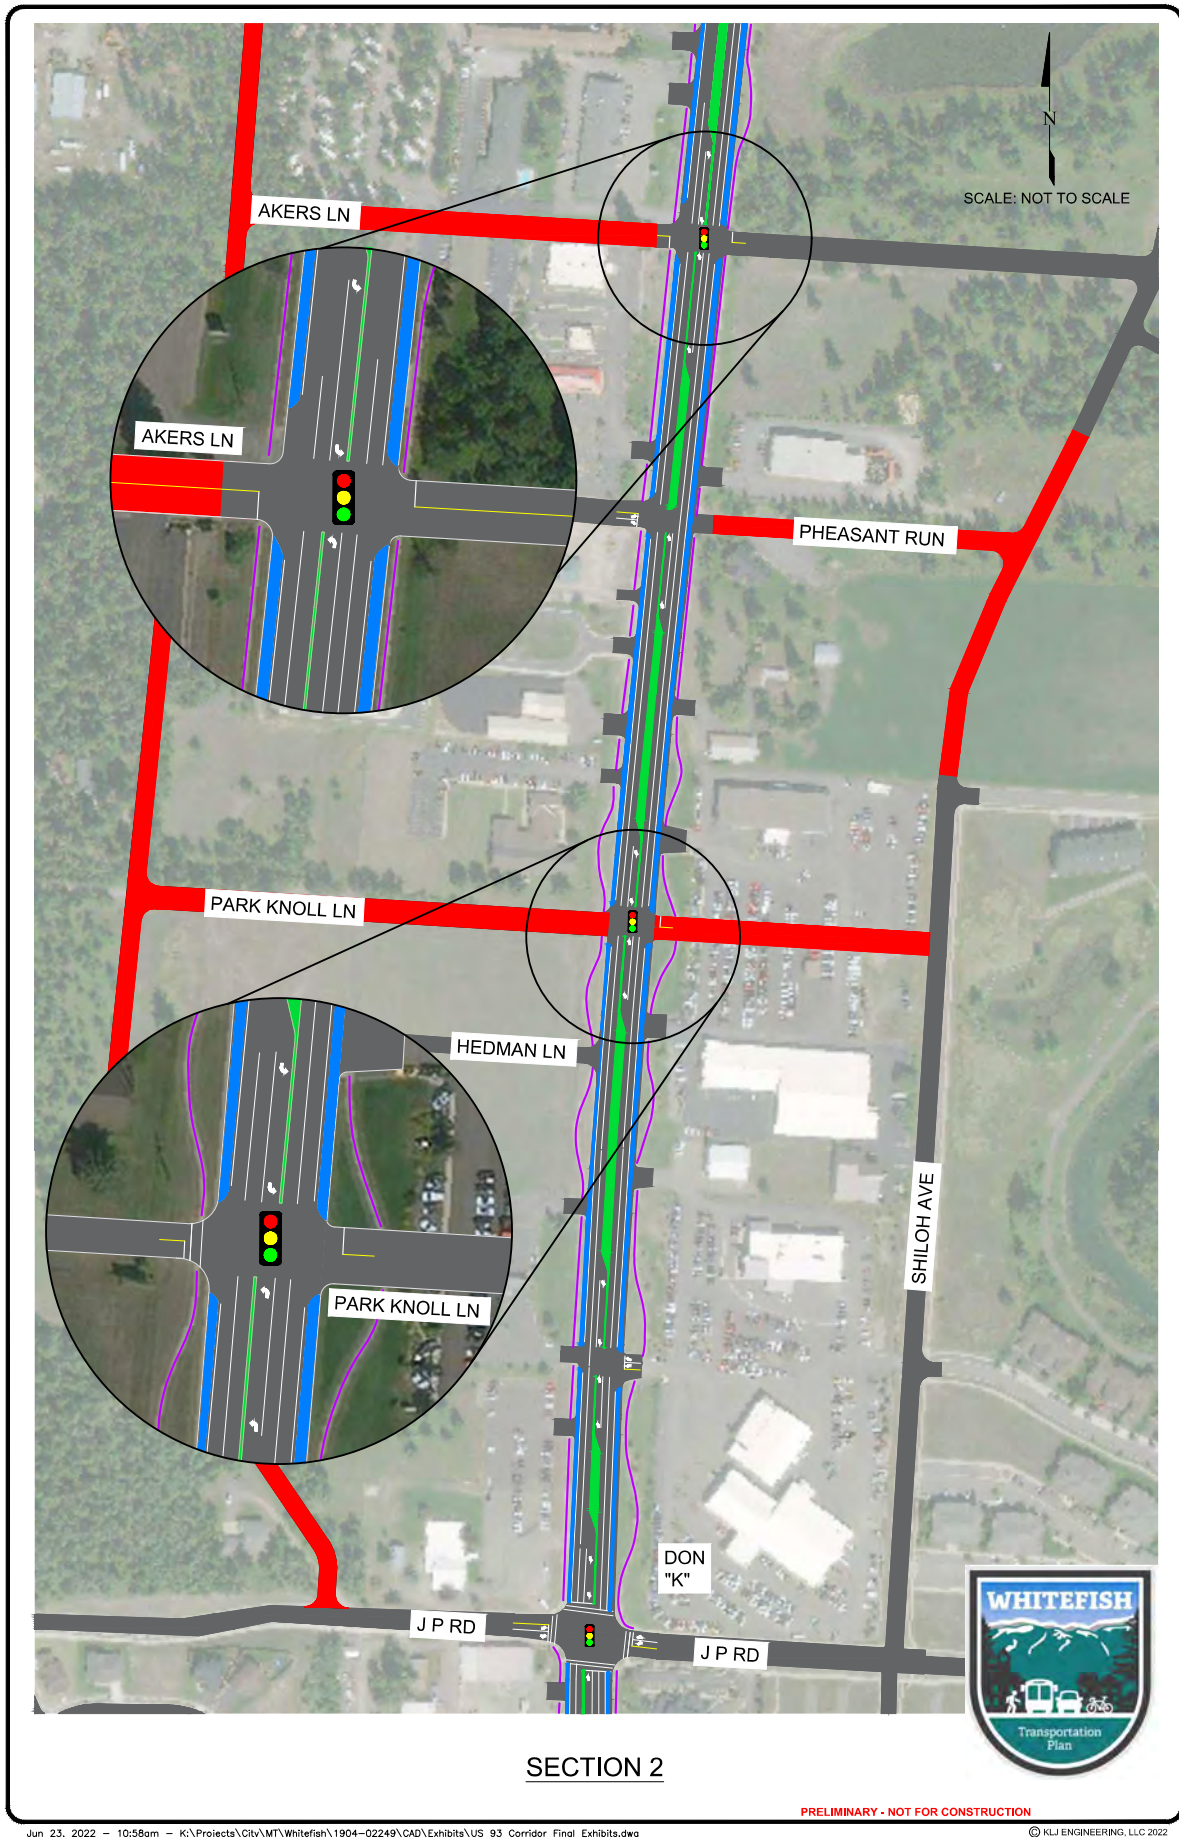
SECTION 2 (JP ROAD TO AKERS LANE)
